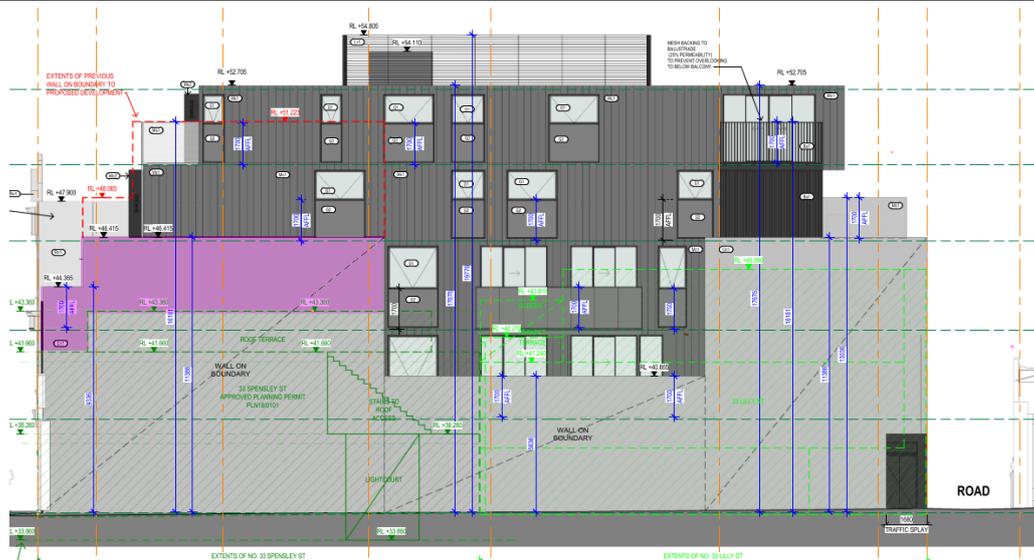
The proposed western elevation, with the exposed concrete wall shown in pink
